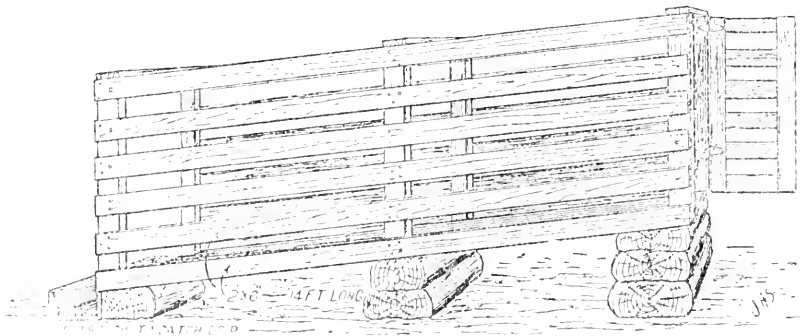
Drip chute. Fourteen ft. long; 2 by 6-in. plank; 5 ft. high. Set with 18-in. slope from front to rear. Trough at rear to catch drip, from which a pipe may be run to connect with tank to carry drip from drip chute back into tank. Floor of drip chute should be tight to prevent waste.
